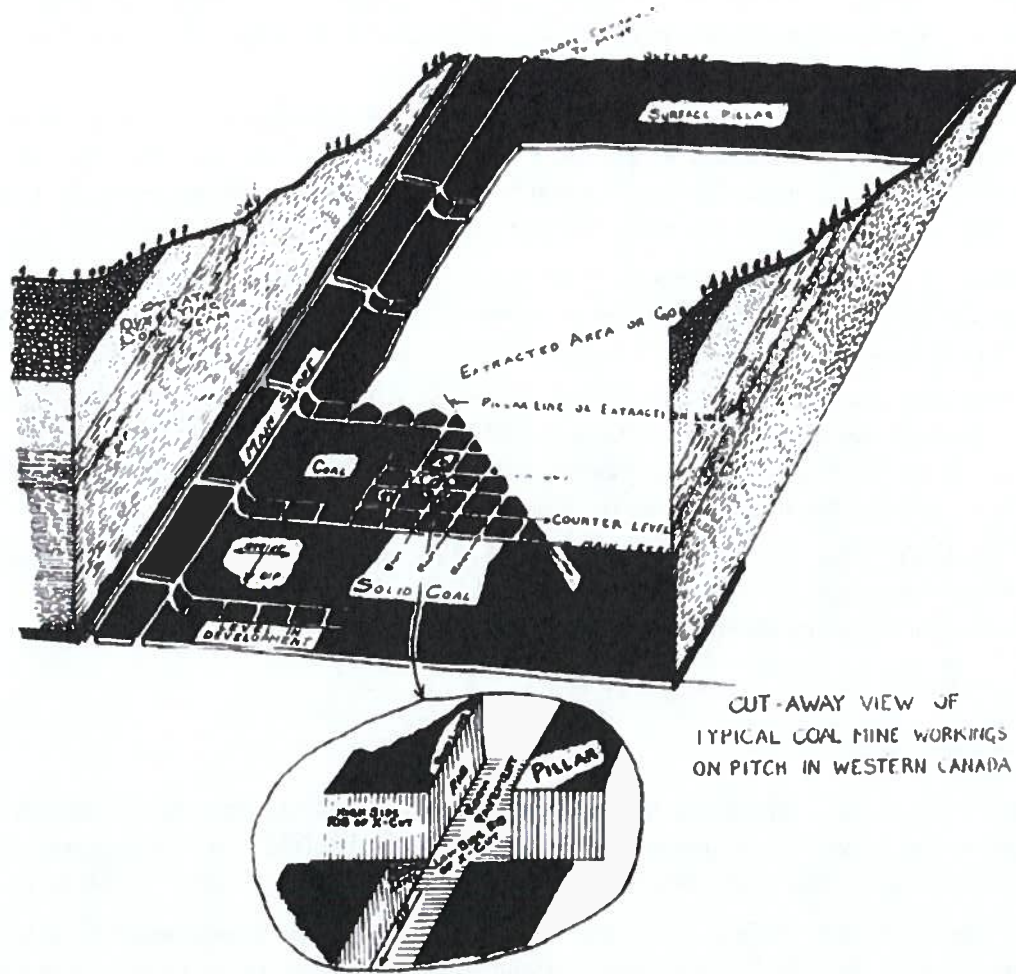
Sketch showing typical mine layout for Western Canada (Norris, 1953)
